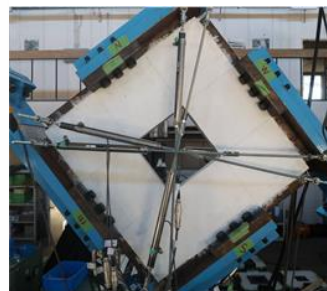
shows the loading rig. Four hydraulic jacks were connected to four loading plates of wall specimen to apply external force to specimen. By applying equal loads in opposite directions, pure shear loading was applied to wall panels. Cyclic loading was applied until peak shear angles reached  $\pm 0.0125\%$ ,  $\pm 0.025\%$ ,  $\pm 0.05\%$ ,  $\pm 0.1\%$ ,  $\pm 0.2\%$ ,  $\pm 0.4\%$ , and  $\pm 0.6\%$ . Specimens were loaded twice in each direction for a given shear angle.
